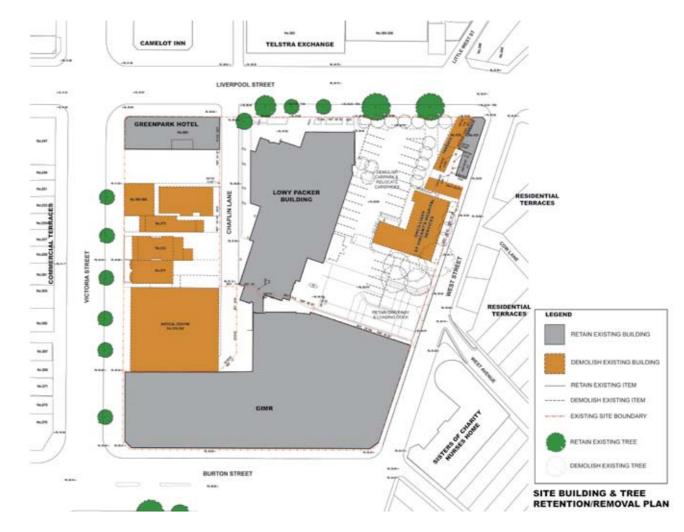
Proposed Demolition / Retention of Buildings and Trees (Source: Daryl Jackson Robyn Dyke Architecture)
